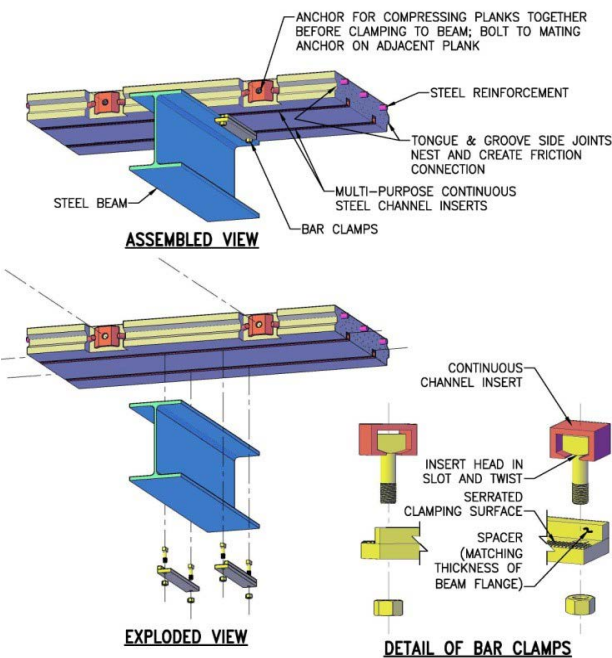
Proposed deconstructable floor system, consisting of precast concrete panels with steel channels embedded on the underside and tongue and groove side joints. Headed bolts, part of a bar clamp assembly, would be inserted into the channels and clamped to the steel beam top flange.
